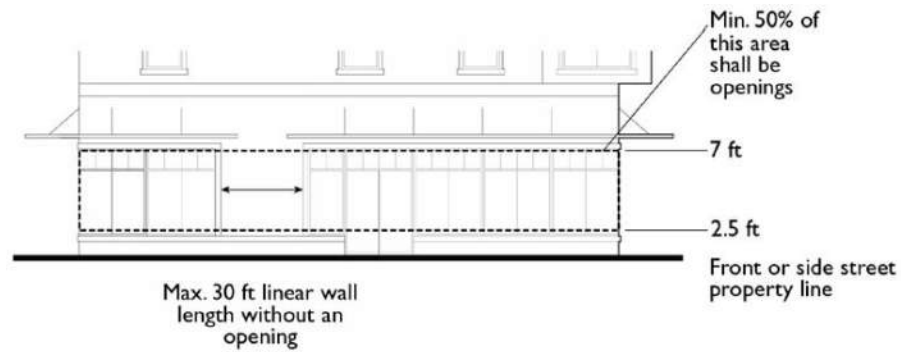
(A)(7): BUILDING TRANSPARENCY/REQUIRED OPENINGS
